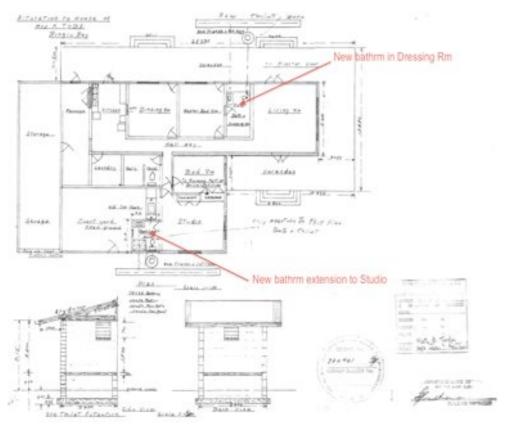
Stage One House additions/alterations, CCRC Bldg file 9179, permit issued Nov'79. Builder JJ Hogan.
